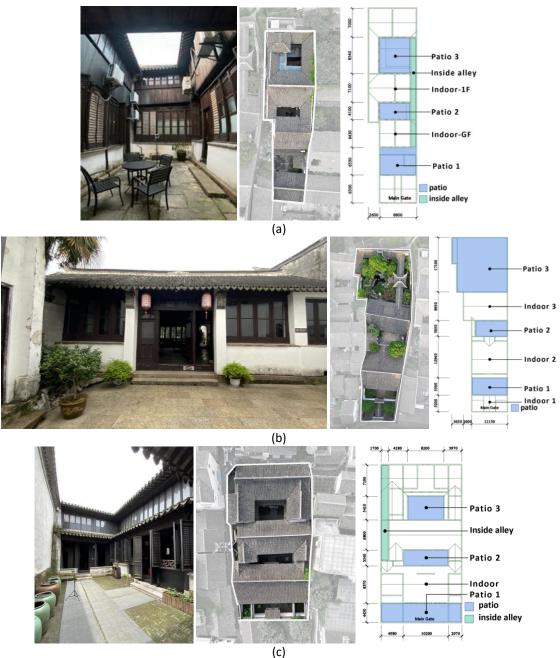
Test buildings and their measurement points (a) Building A (b) Building B (c) Building C
